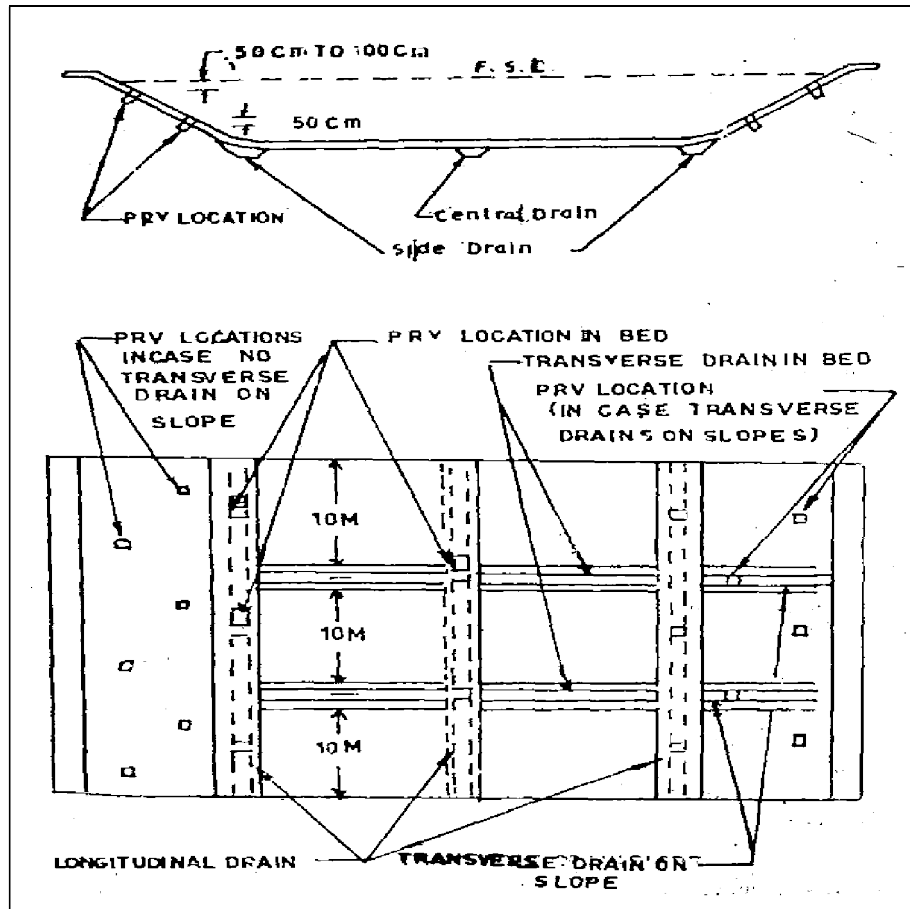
SECTION OF LONGITUDINAL/TRANSVERSE DRAINS
